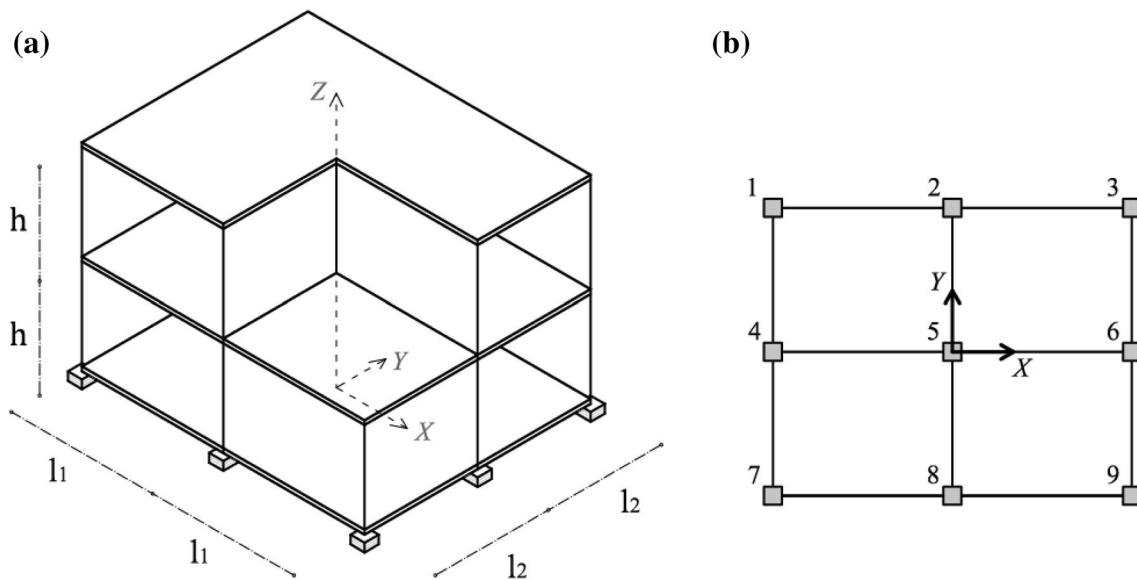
Two-story reinforced concrete base-isolated structure: a elevation; b plan
